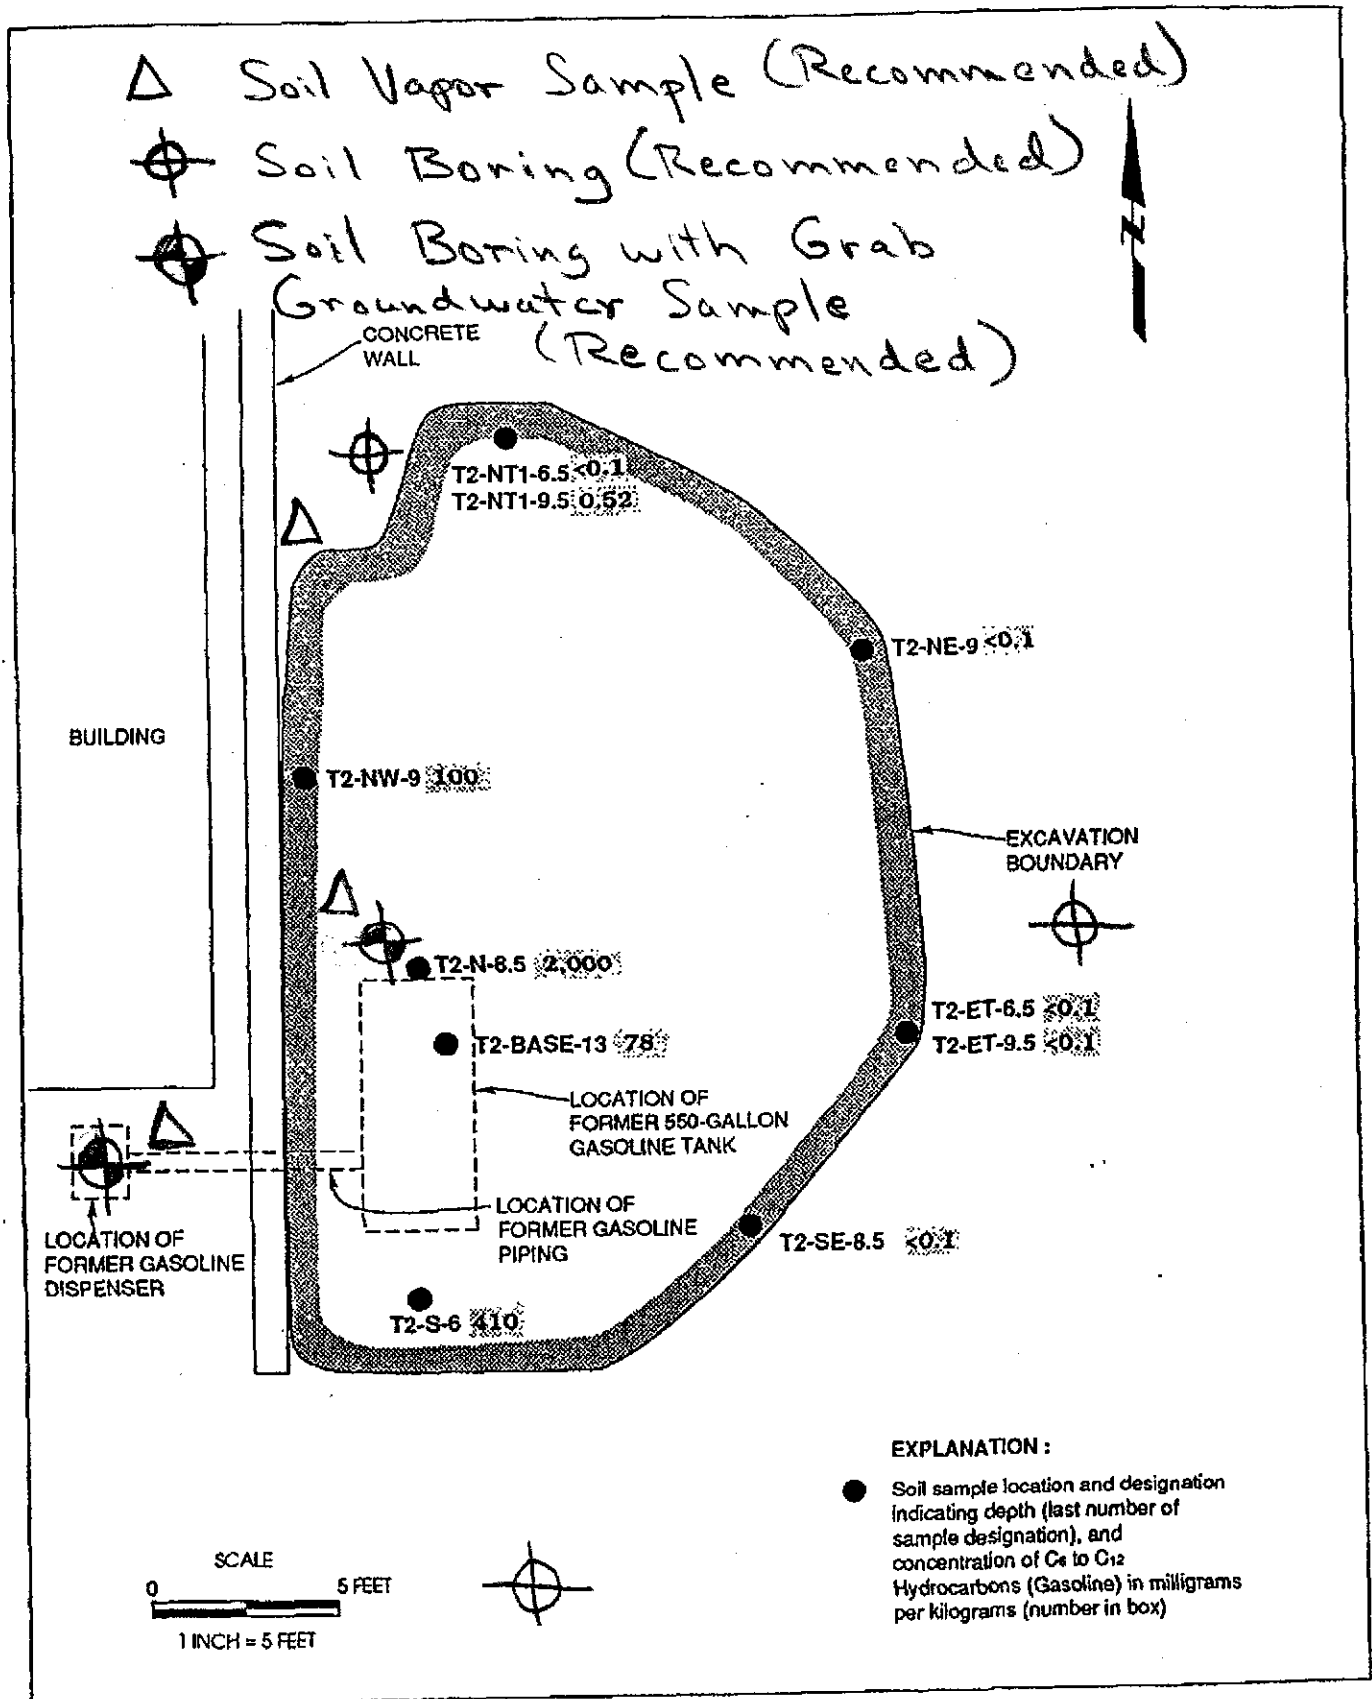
SITE PLAN SHOWING FORMER TANK LOCATION, EXCAVATION AND SOIL SAMPLE LOCATIONS
